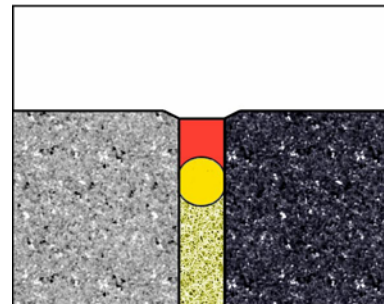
dilatation joint in concrete, Sealer Field on backfoam
